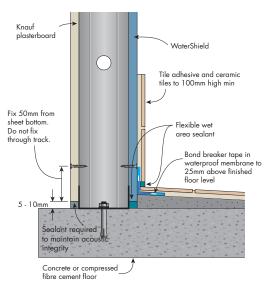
Wall Base in Wet Areas (Outside Shower)
